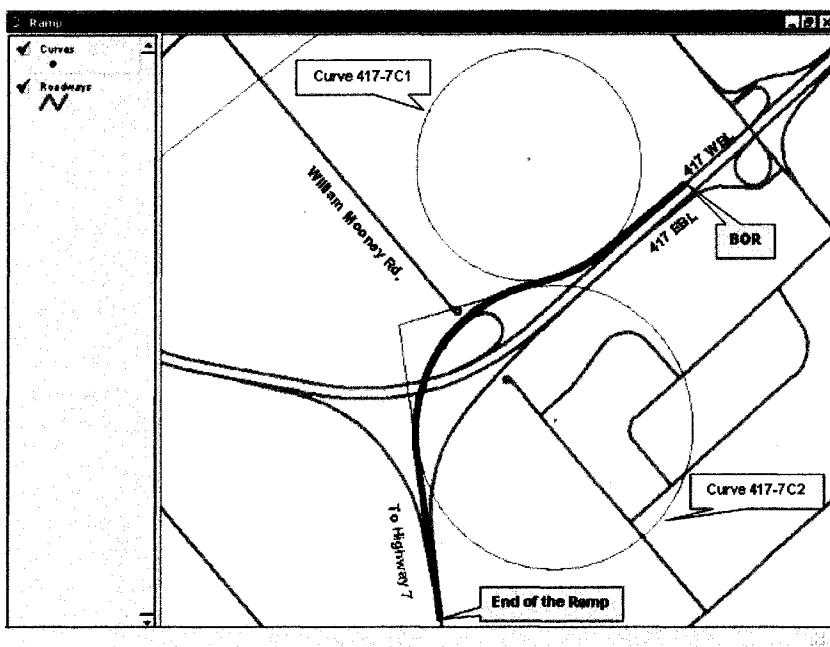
Exit Ramp of Highway 417 (Ramp 3).
